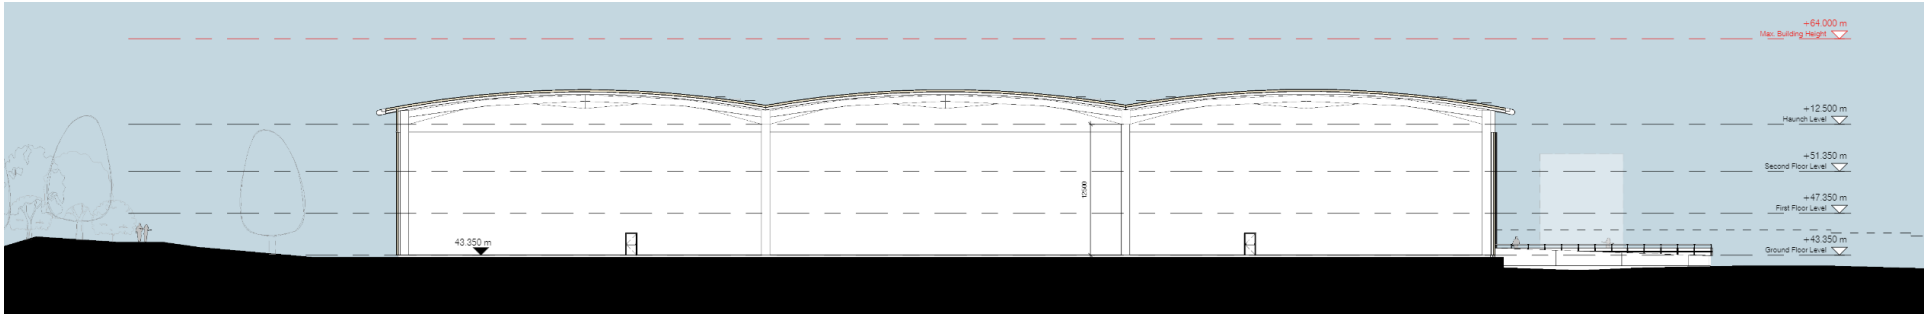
Section through proposed building, western footway, and eastern service yard/car park (east to west)
